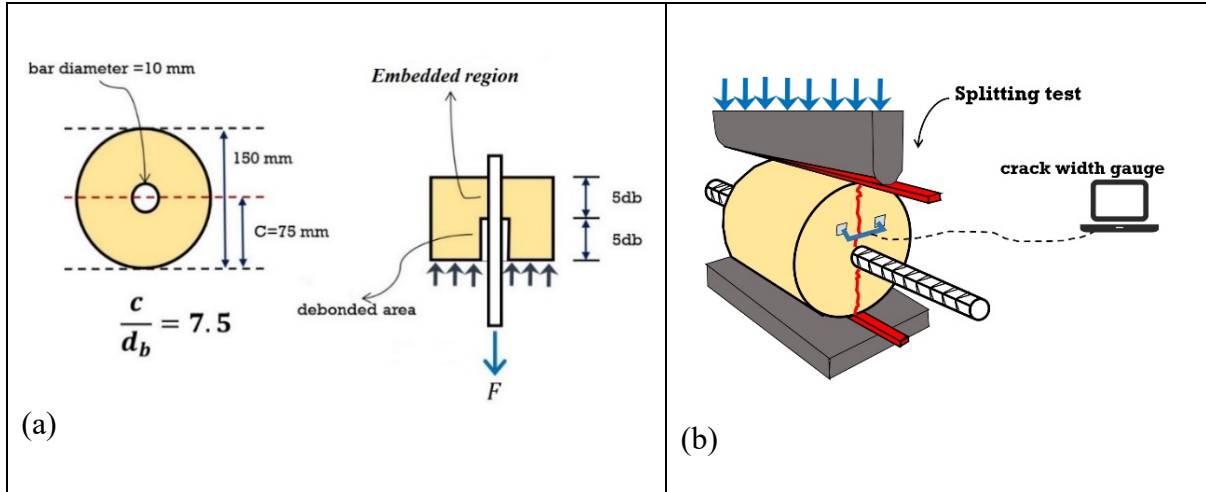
Test set-up: (a) pull-out test; (b) splitting test for providing pre-cracking damage (using crack gauges at both side of specimens)
